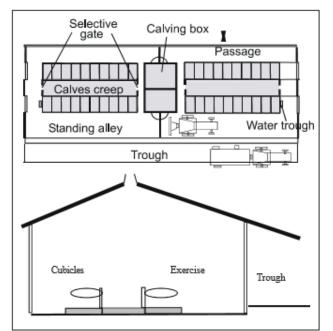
Arrangement and cross-section of the fixed standing construction with the calves between the rows intended for the cows.. (Brigitta KRIMBERGER. 2004)
